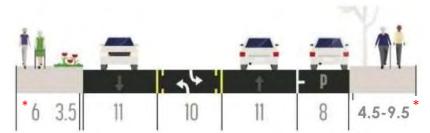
Typical 13th Street cross section (looking south) developed during Phase 2
